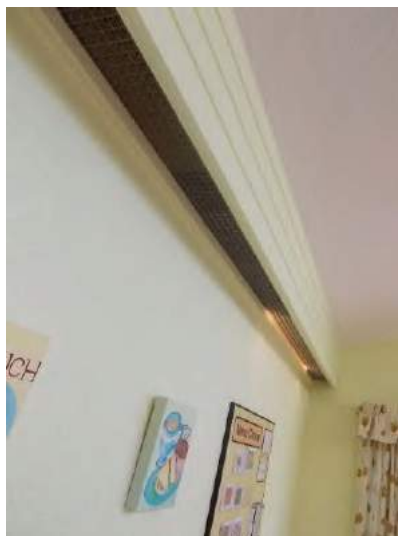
Typical corridor lighting, not all of the luminaires were operational.
